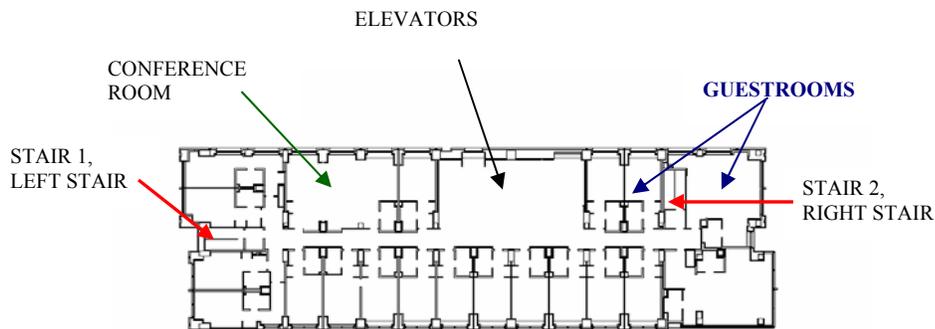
An AutoCAD drawing of Floor 4 – changed to Floor 1
